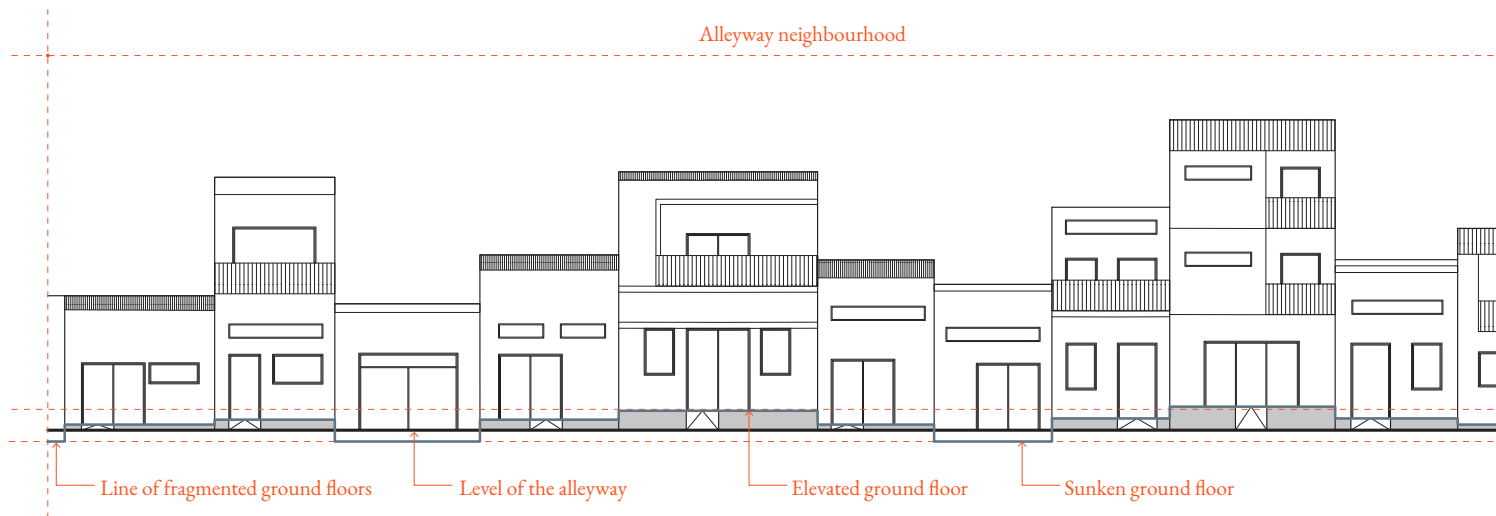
Elevation showing the result of the competition for high ground. Ground floor levels are all inconsistent with many houses below the alleyway level.
